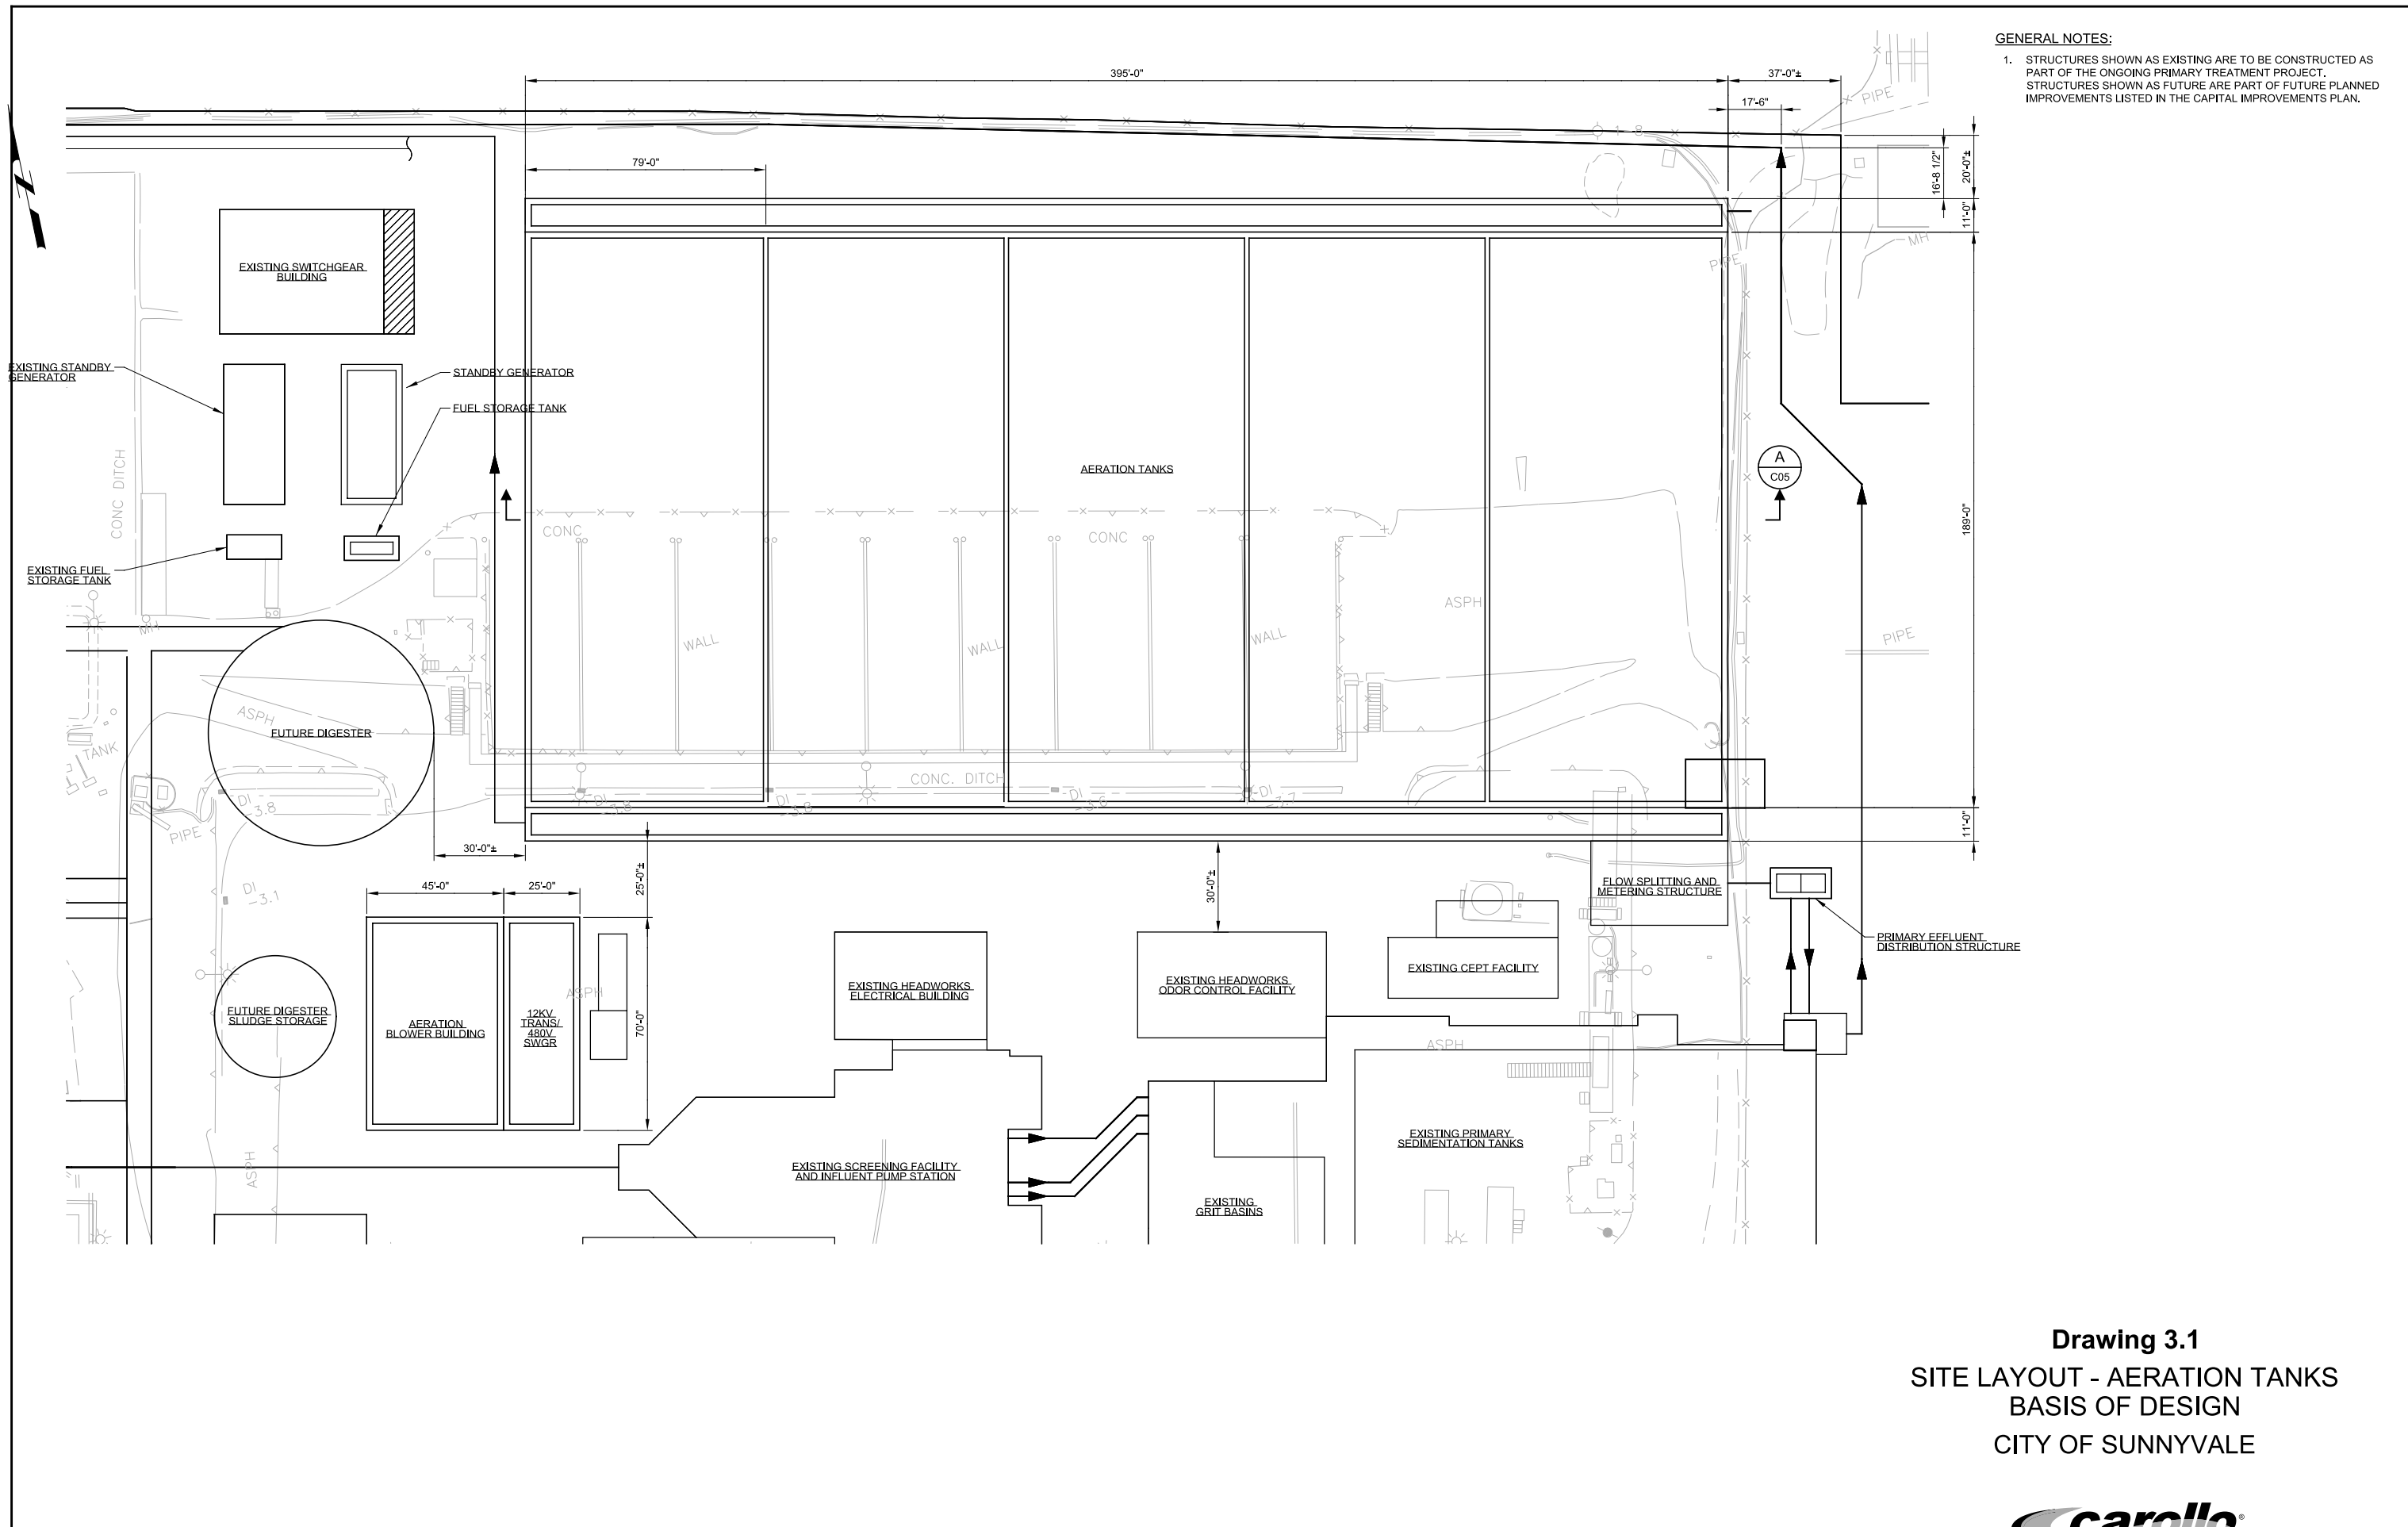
and 3.2 are conceptual site layout drawings showing unit processes and their locations. Drawing 3.3 shows typical tank sections. A conceptual layout for the blower building is included as Drawing 3.4. Drawing 3.5 is a process flow diagram for the CAS secondary treatment process.
